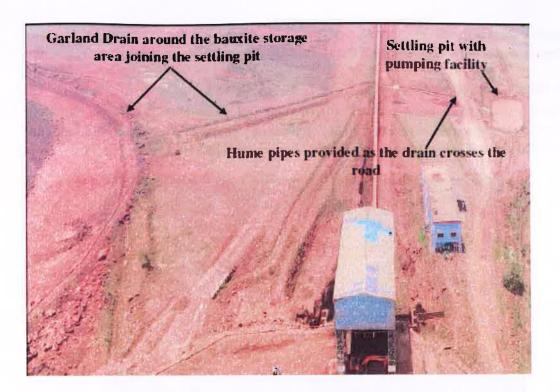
View of earthen retaining wall and garland drains near the bauxite storage area and crusher
